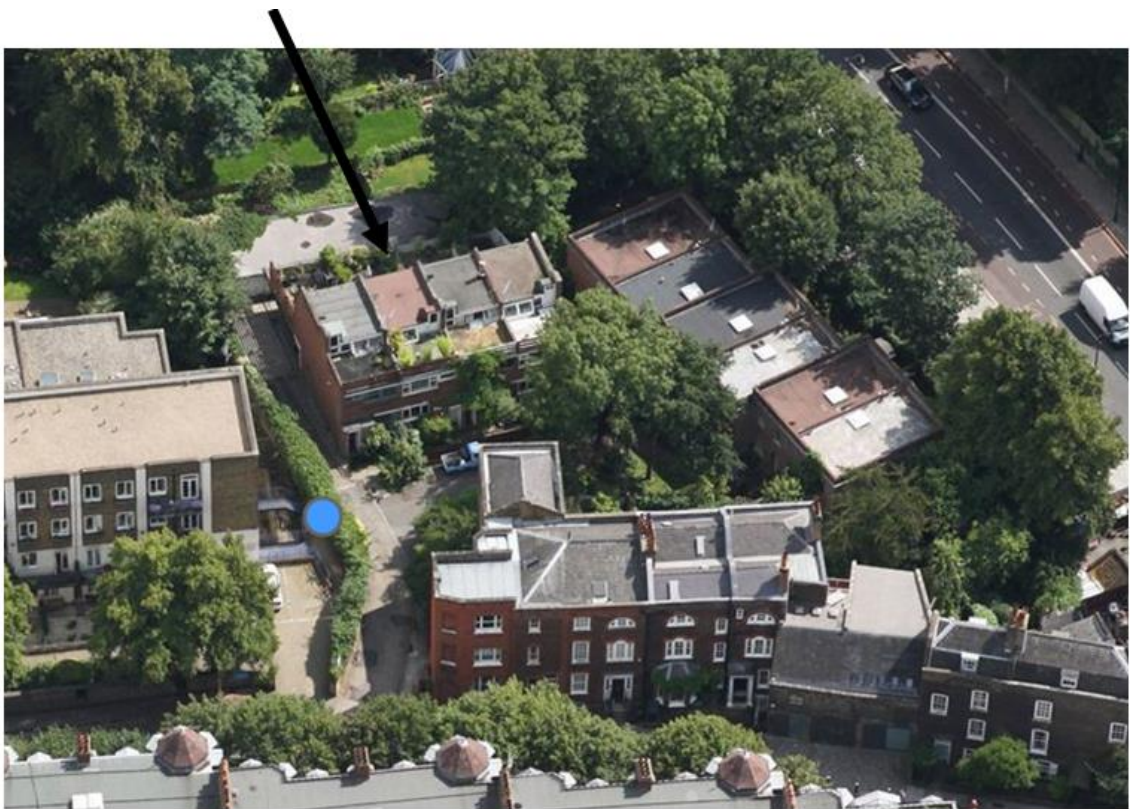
Aerial photograph showing the front elevations of No's 1 – 4 Netherleigh Close with existing roof terrace
